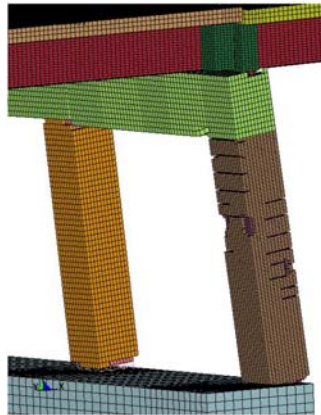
Damage Mechanism A2: Shearing of the Pier from the Footing
